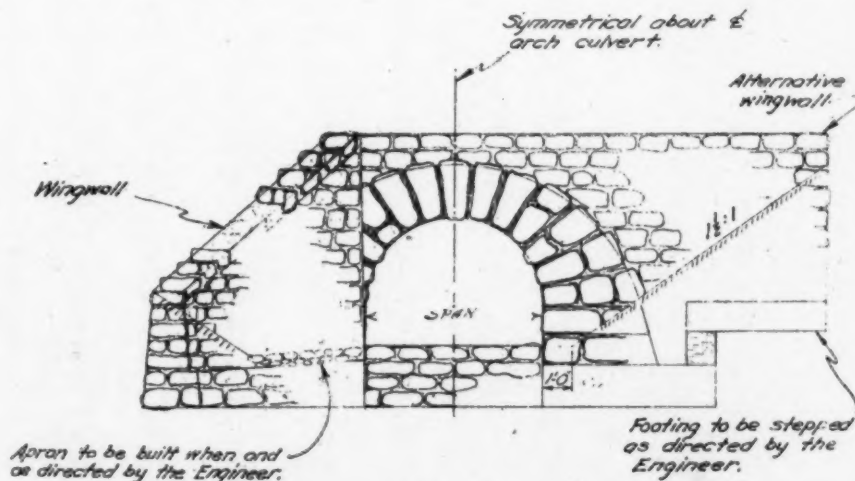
Elevation of 3-ft. to 6-ft. rubble masonry arch culvert with wing walls
